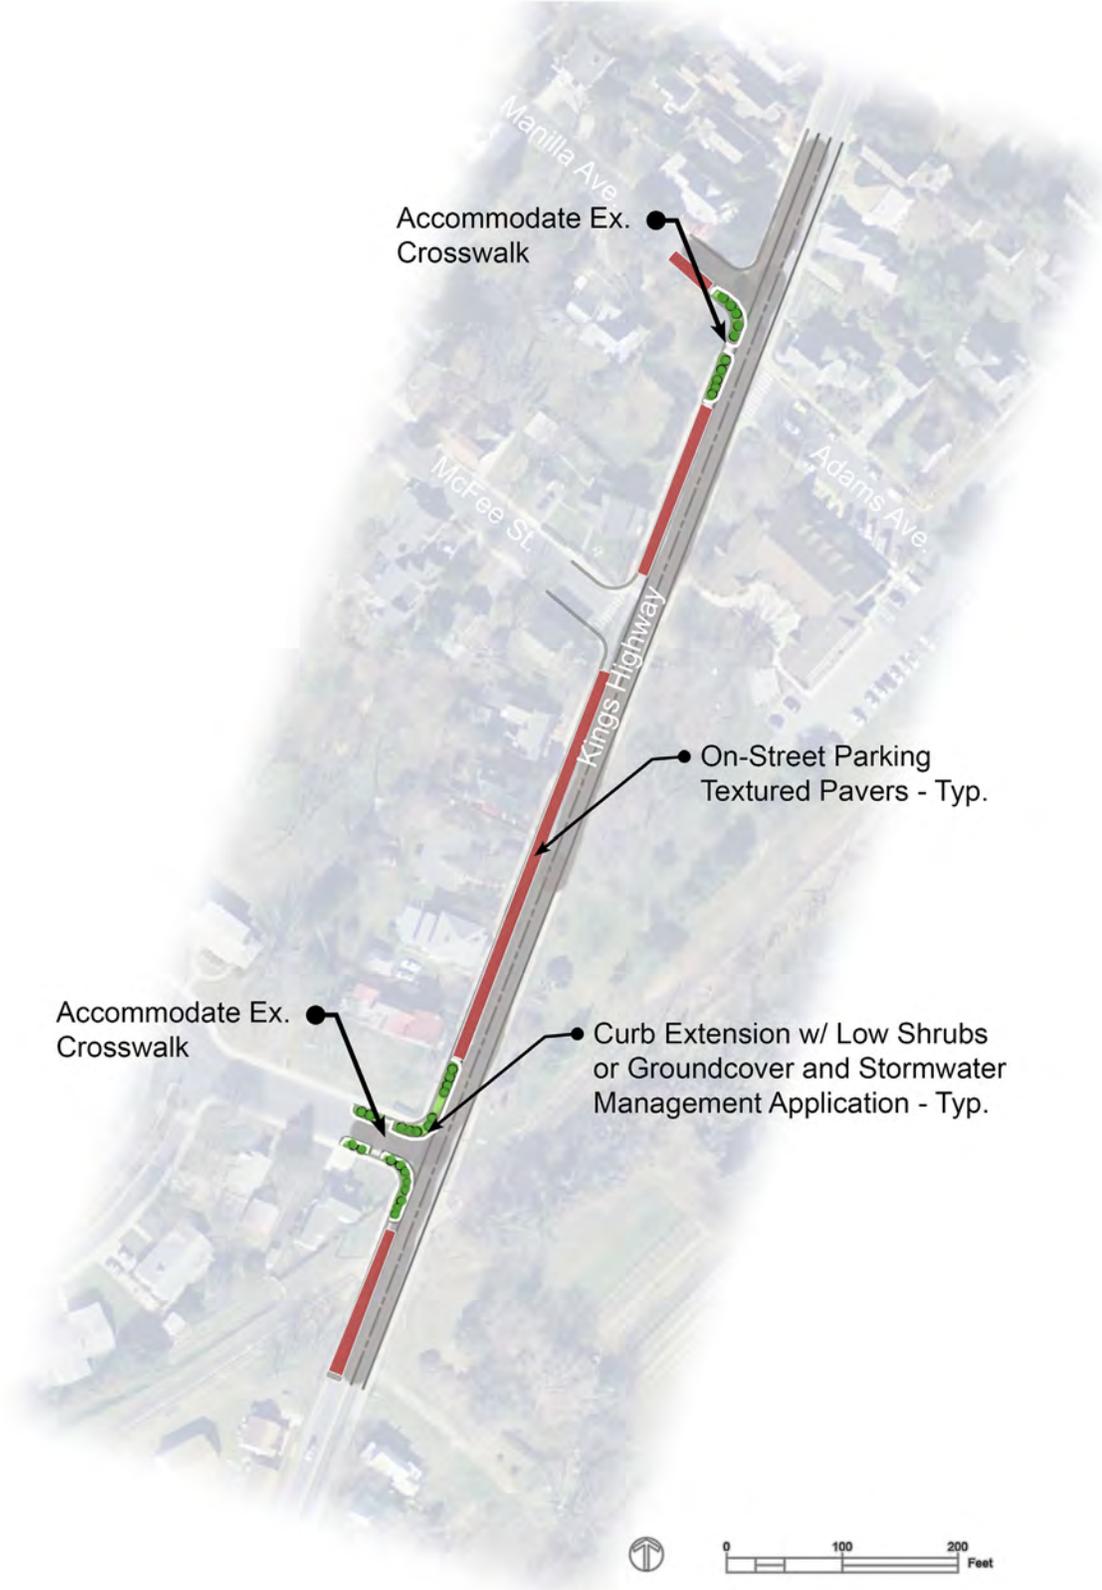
Illustrative example of showing locations where curb extensions and on street parking with pervious pavers could be installed to manage stormwater runoff and increase pedestrian safety at crosswalks on Kings Highway within the City of Lewes. Further study and public input is needed.
